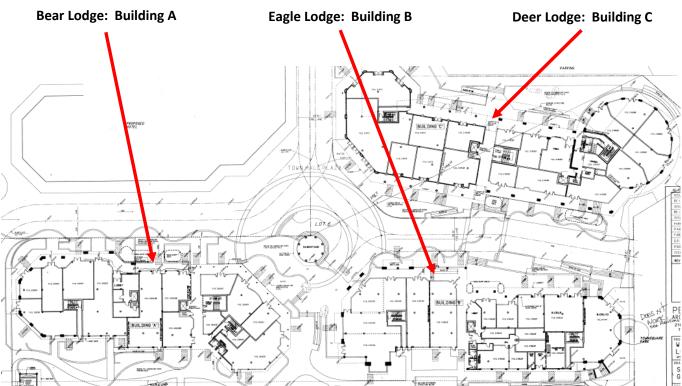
General Arrangement of the (3) Buildings at Whistler Town Plaza
